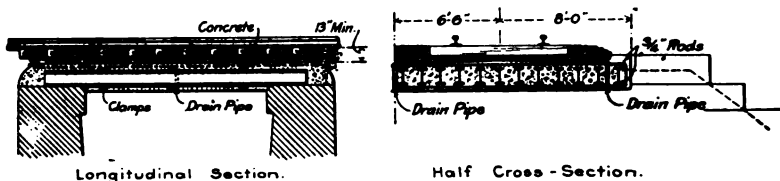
Steel Beam Bridge, B. & O. R. R.
